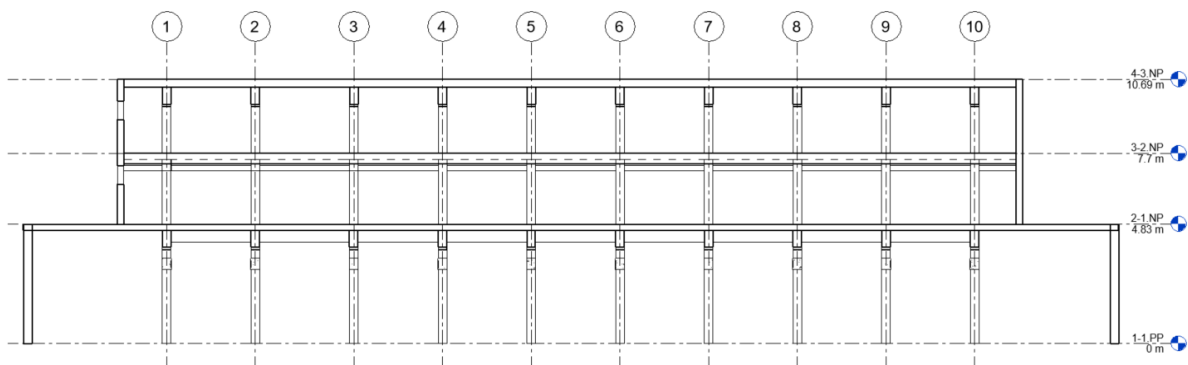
Longitudinal Frame Cross Section looking East – Frame Beams Exist at Levels 1NP and 2NP
